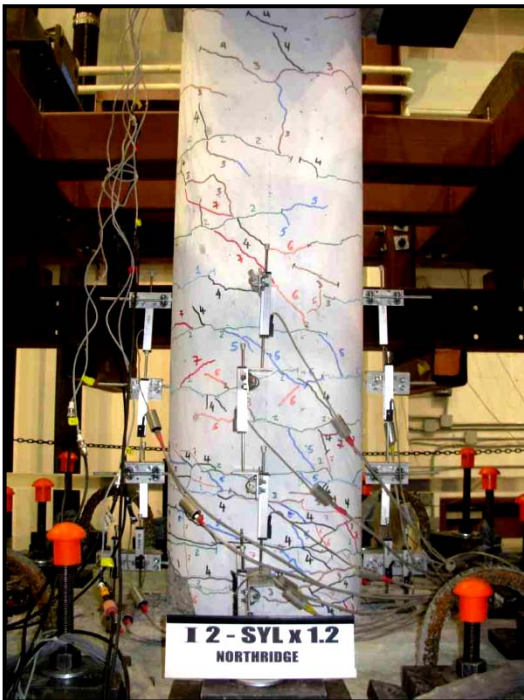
Specimen I2, Increasing of Cracks and Spalling (SYLx1.2)
